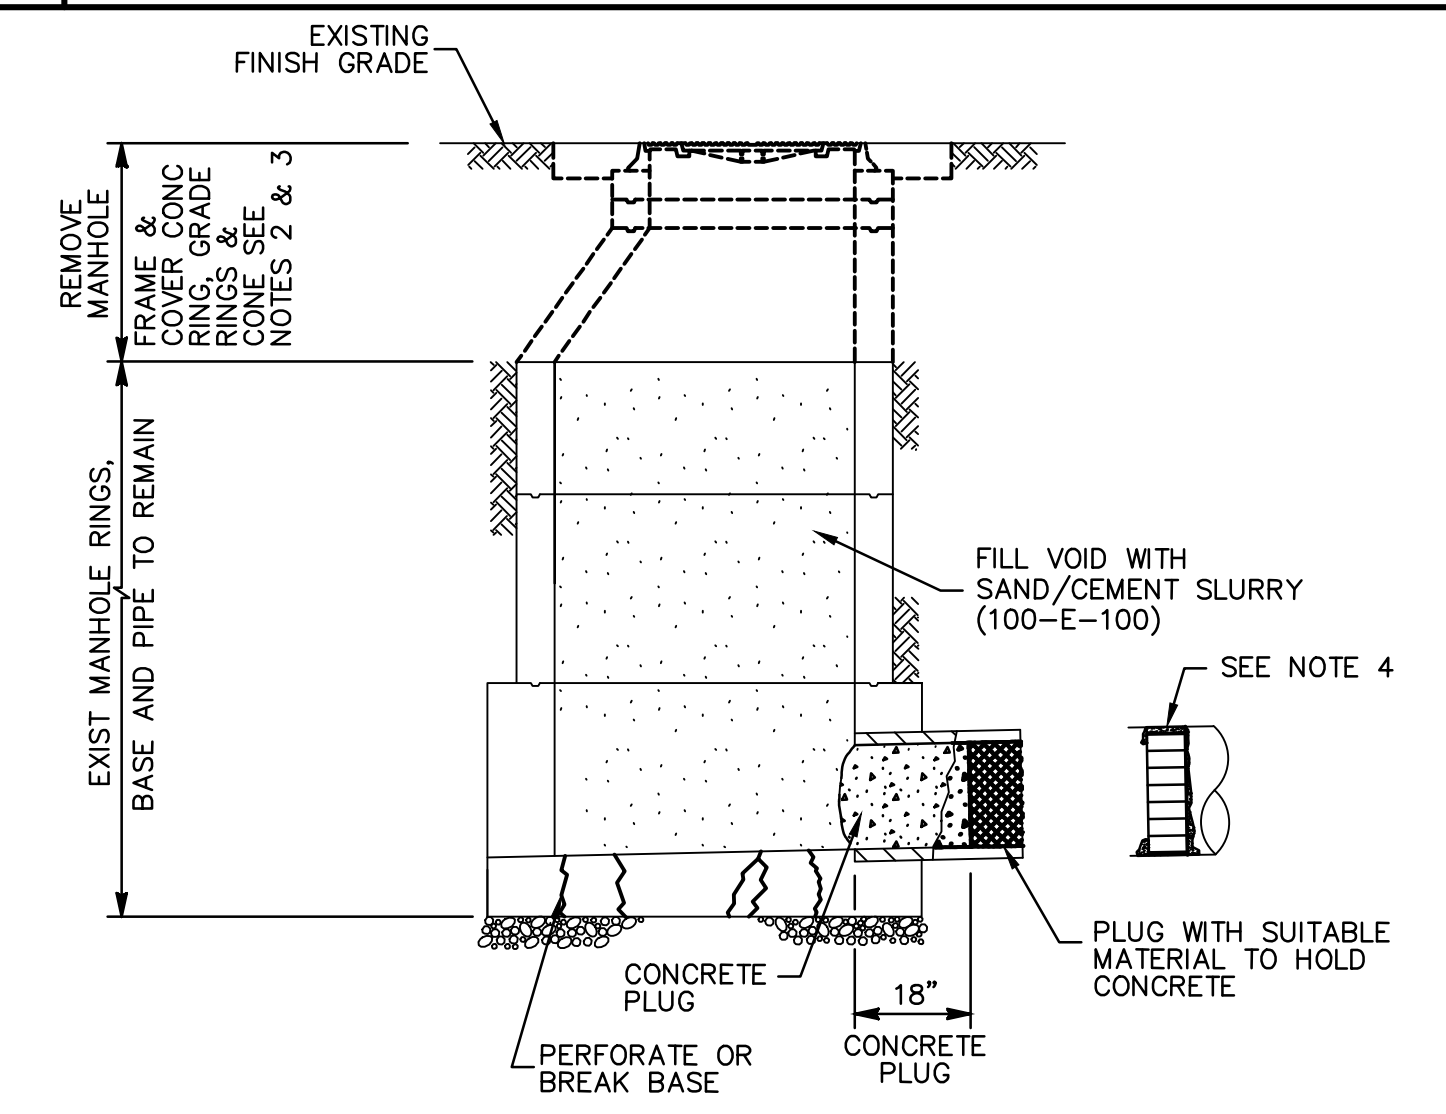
TYPICAL SEWER MAIN ABANDONMENT
